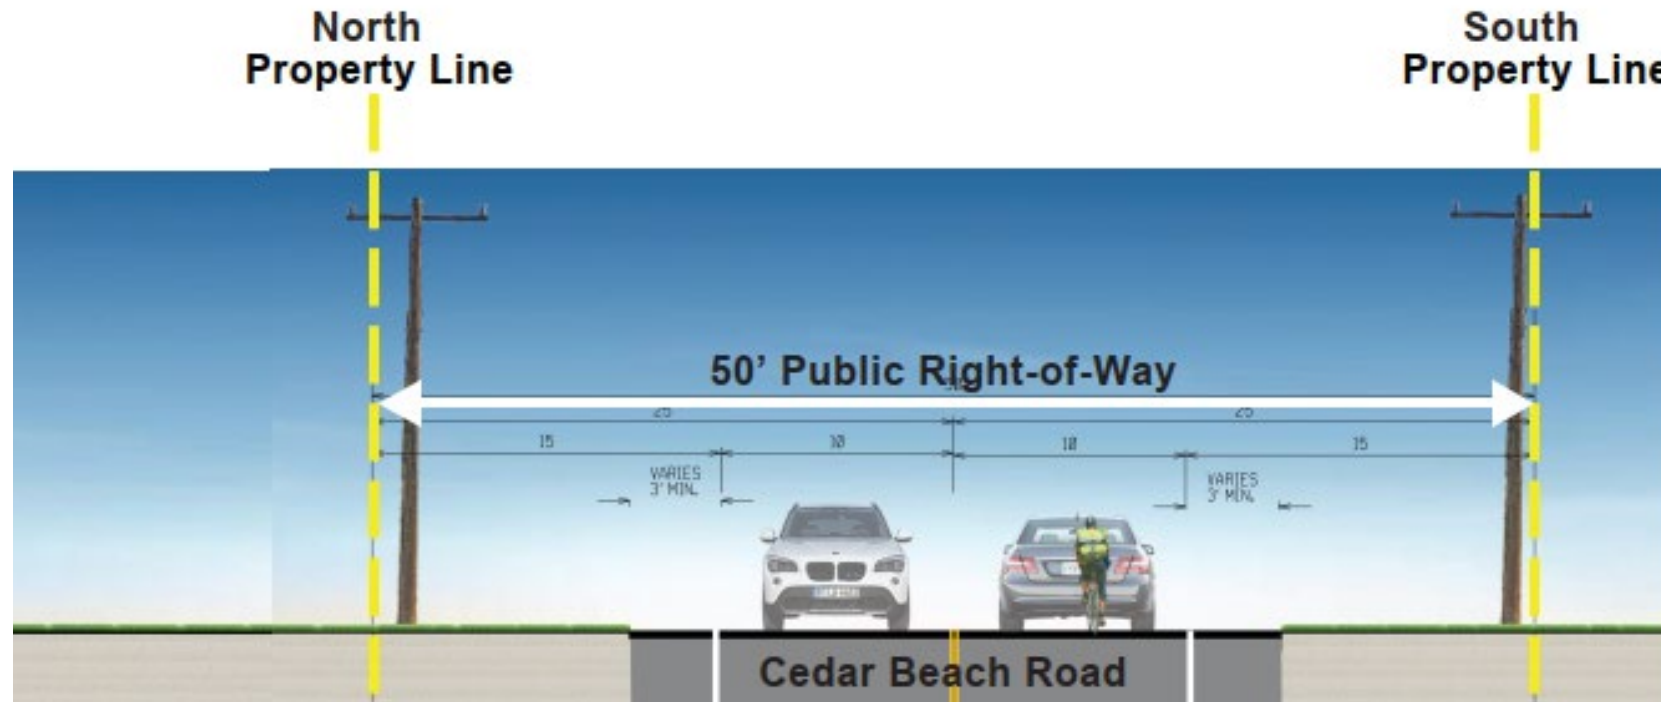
Segment 2 existing typical section looking eastbound towards Slaughter Beach
